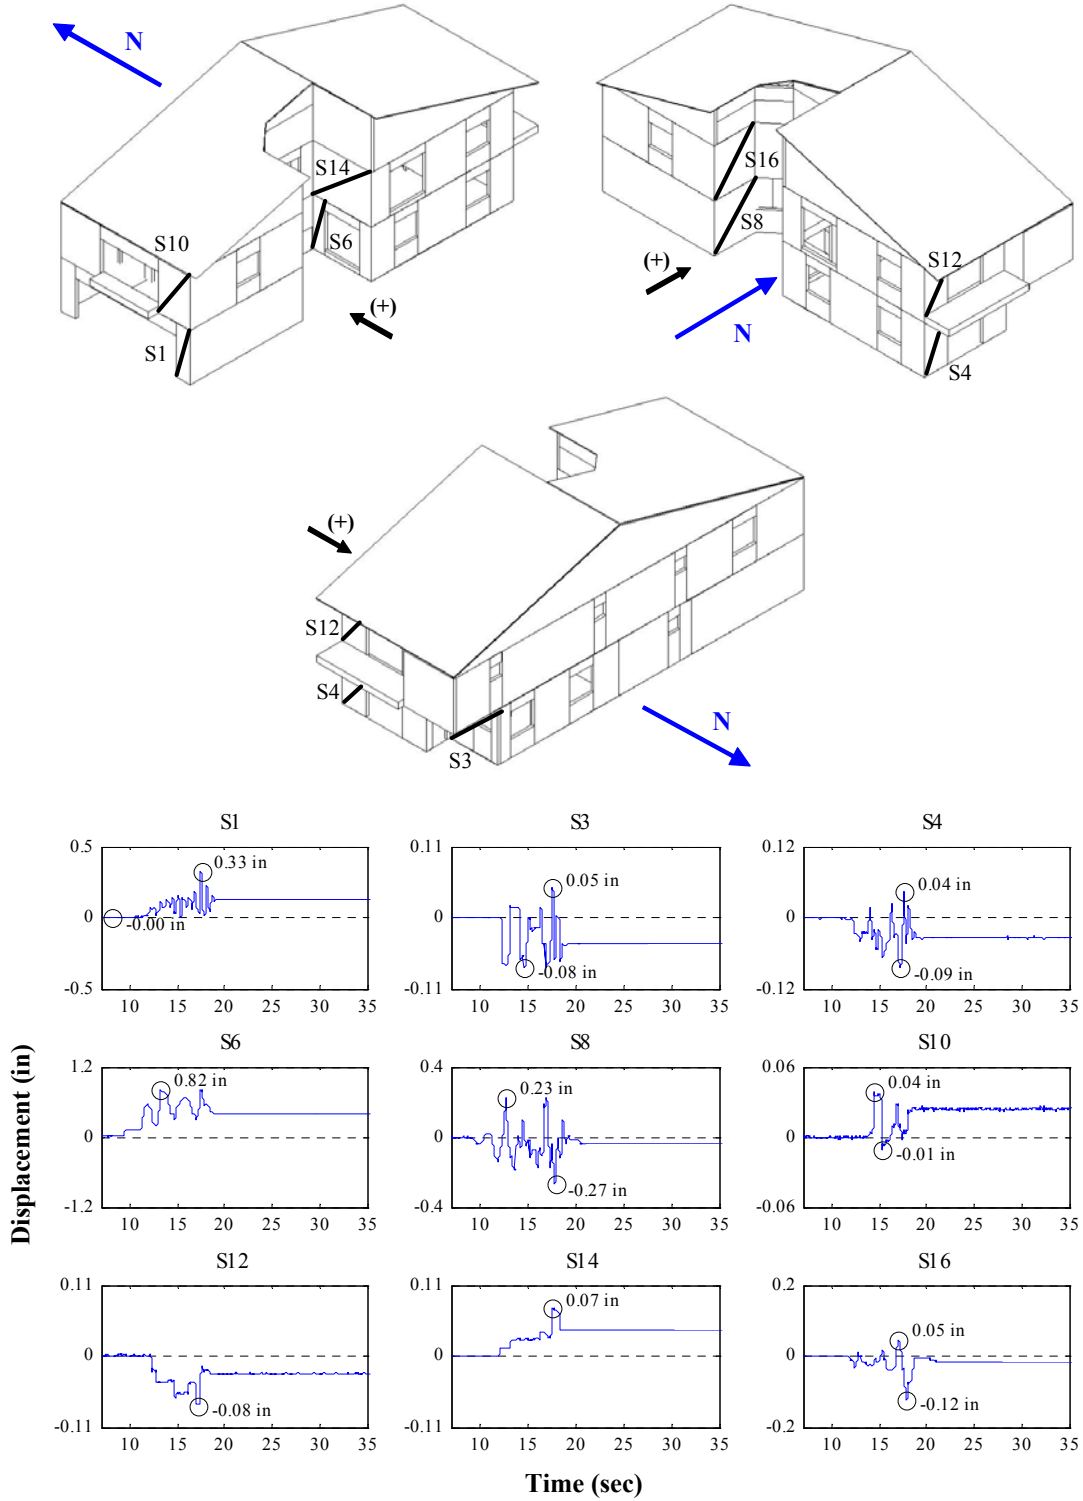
Wall deformations of north-south external walls for Test NWP1S05
